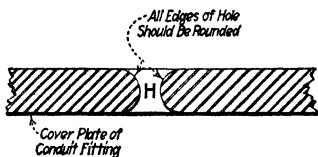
Showing how edges of hole through cover plate should be rounded off.
